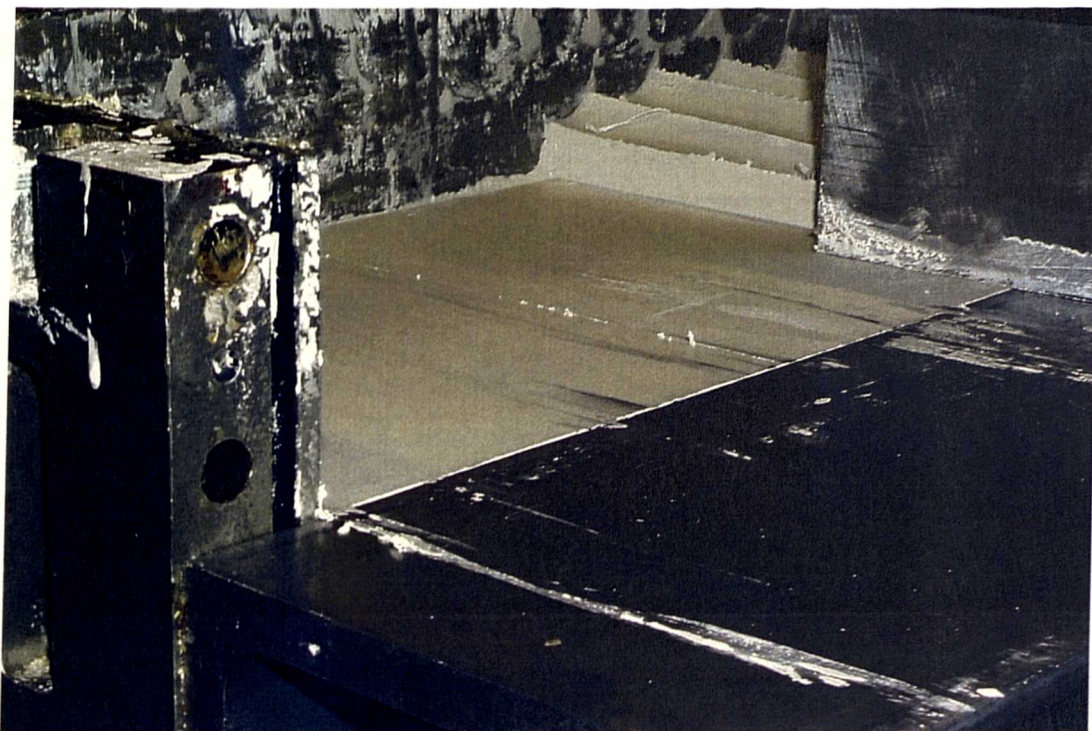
Final trimming to level was carried out using an extruded aluminium box section guided with a 150mm wide shelf angle bolted to the strongbox
